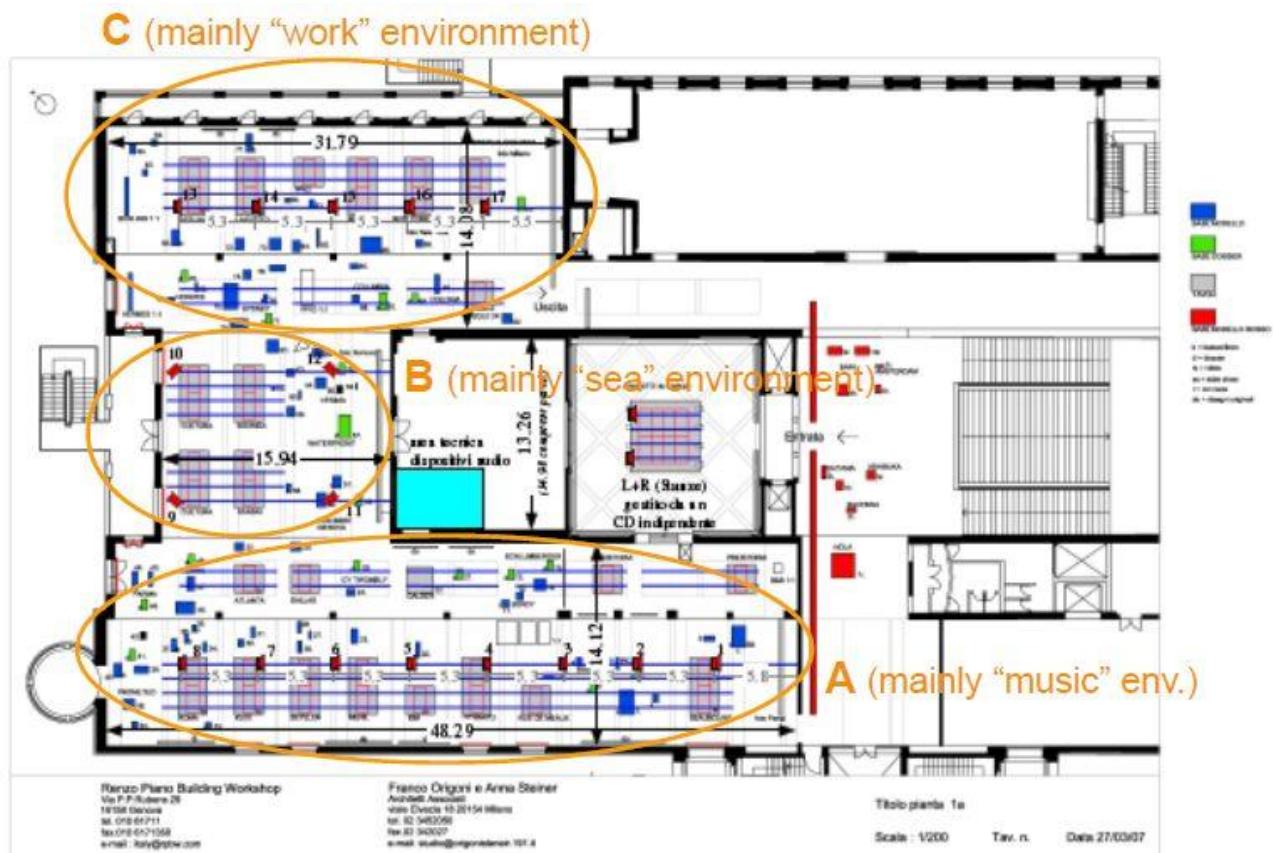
Floor plan of the Renzo Piano Building Workshop “Visible Cities”, Milan Triennale 2007
